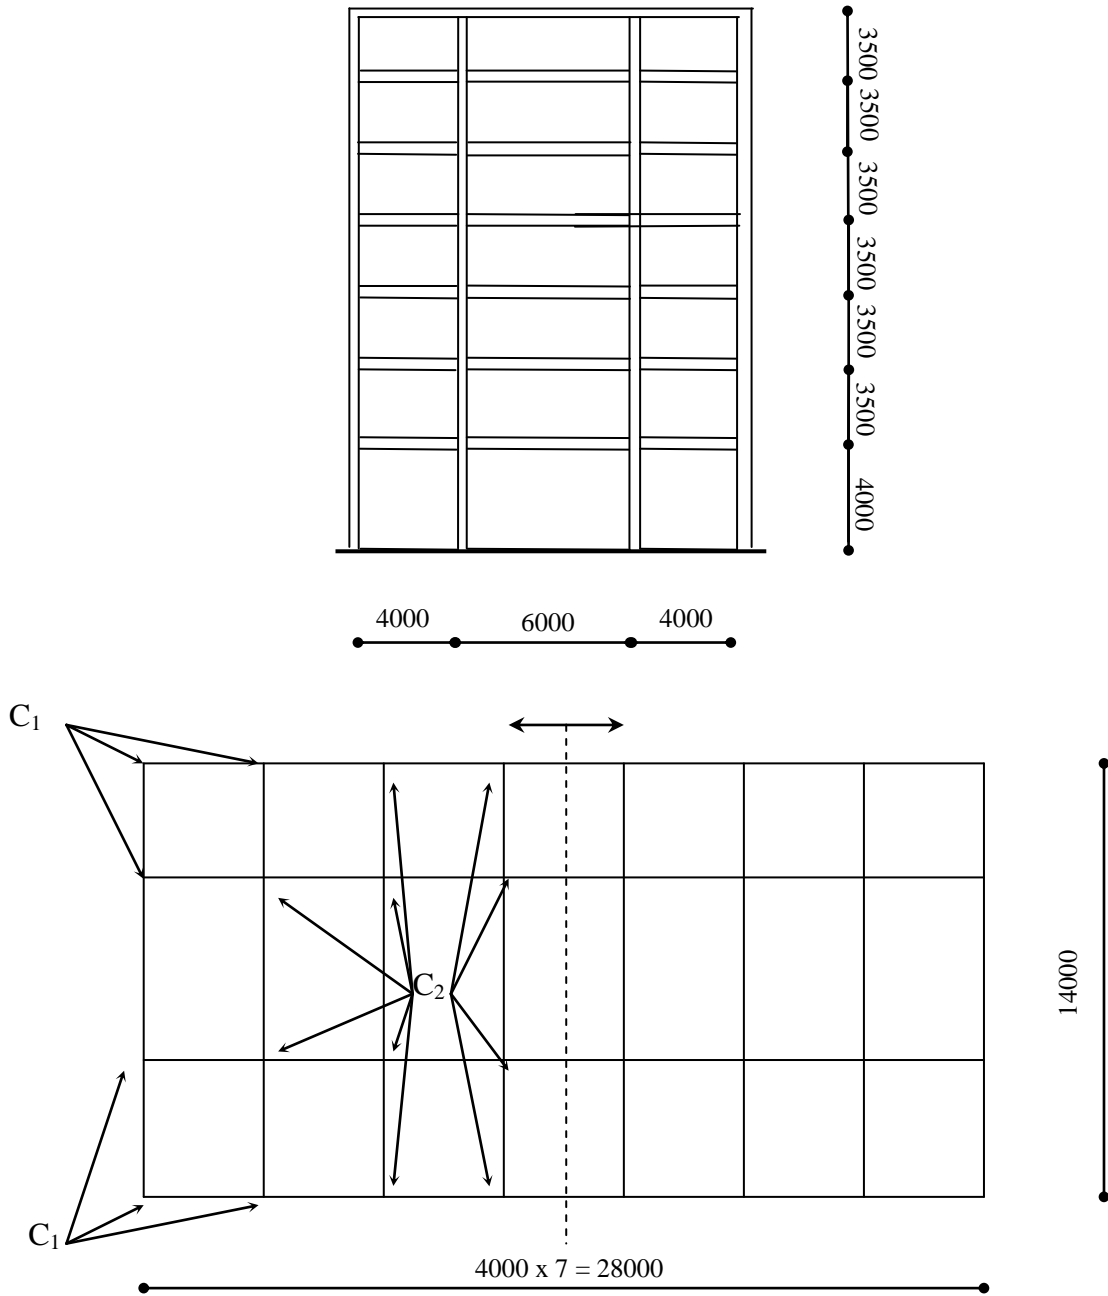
Schematic transversal view and plan of seven-story steel building (dimensions in millimeters)
